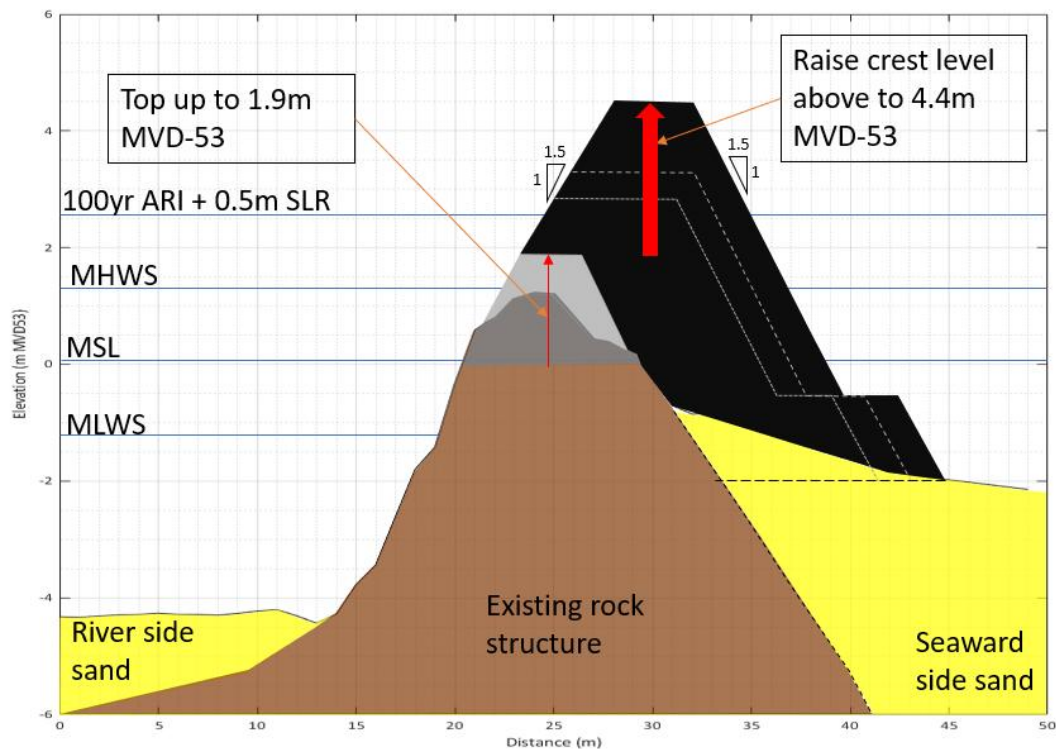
Schematic showing possible crest levels on top of existing example profile (chainage 700-800)
